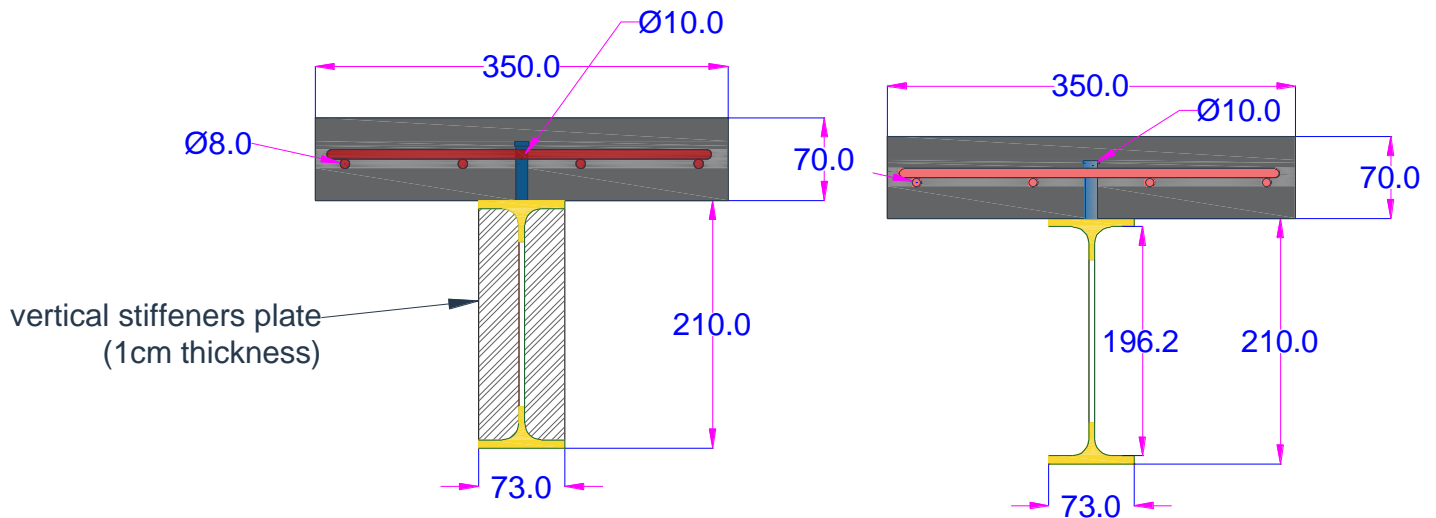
Typical Cross-Section of the CB-S9R and CB-H9R.
